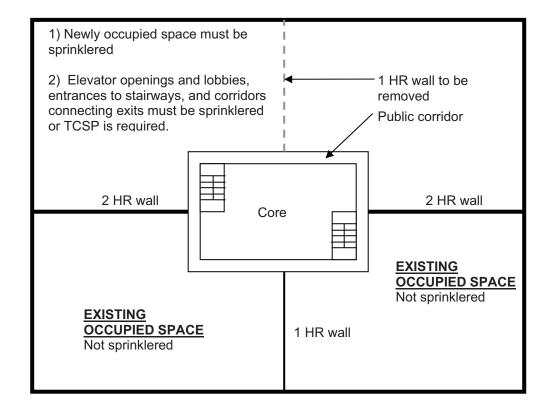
REMOVAL OF A 1-HOUR WALL ON AN EXISTING, COMPARTMENTED FLOOR
